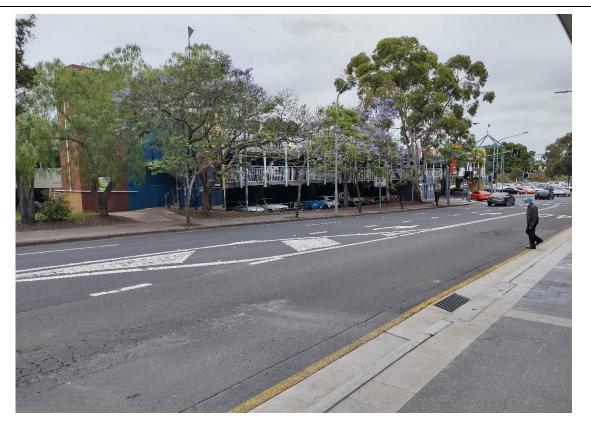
Multi-storey carpark from Marion Street, facing south-west
